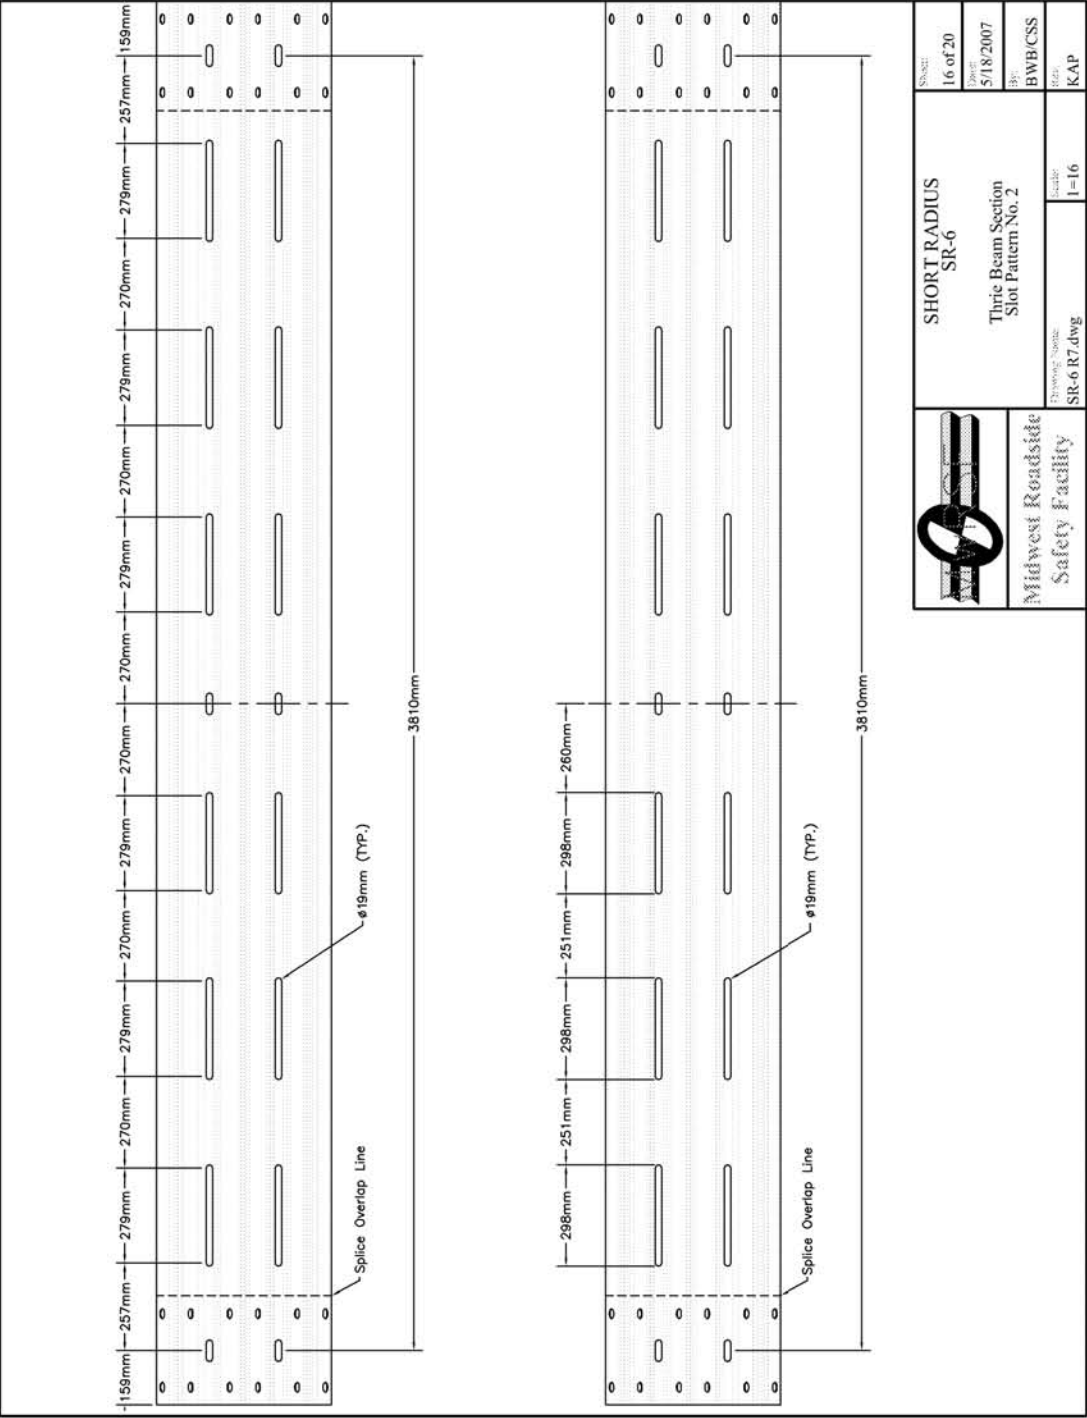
Rail Slot Pattern Details, Rail Section No. 2, Test SR-6
